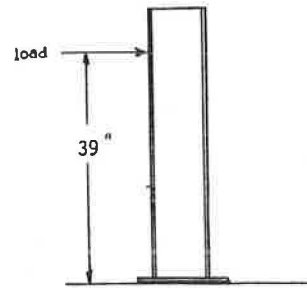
Detail of steel guard fence post and attachment to culvert slab.
